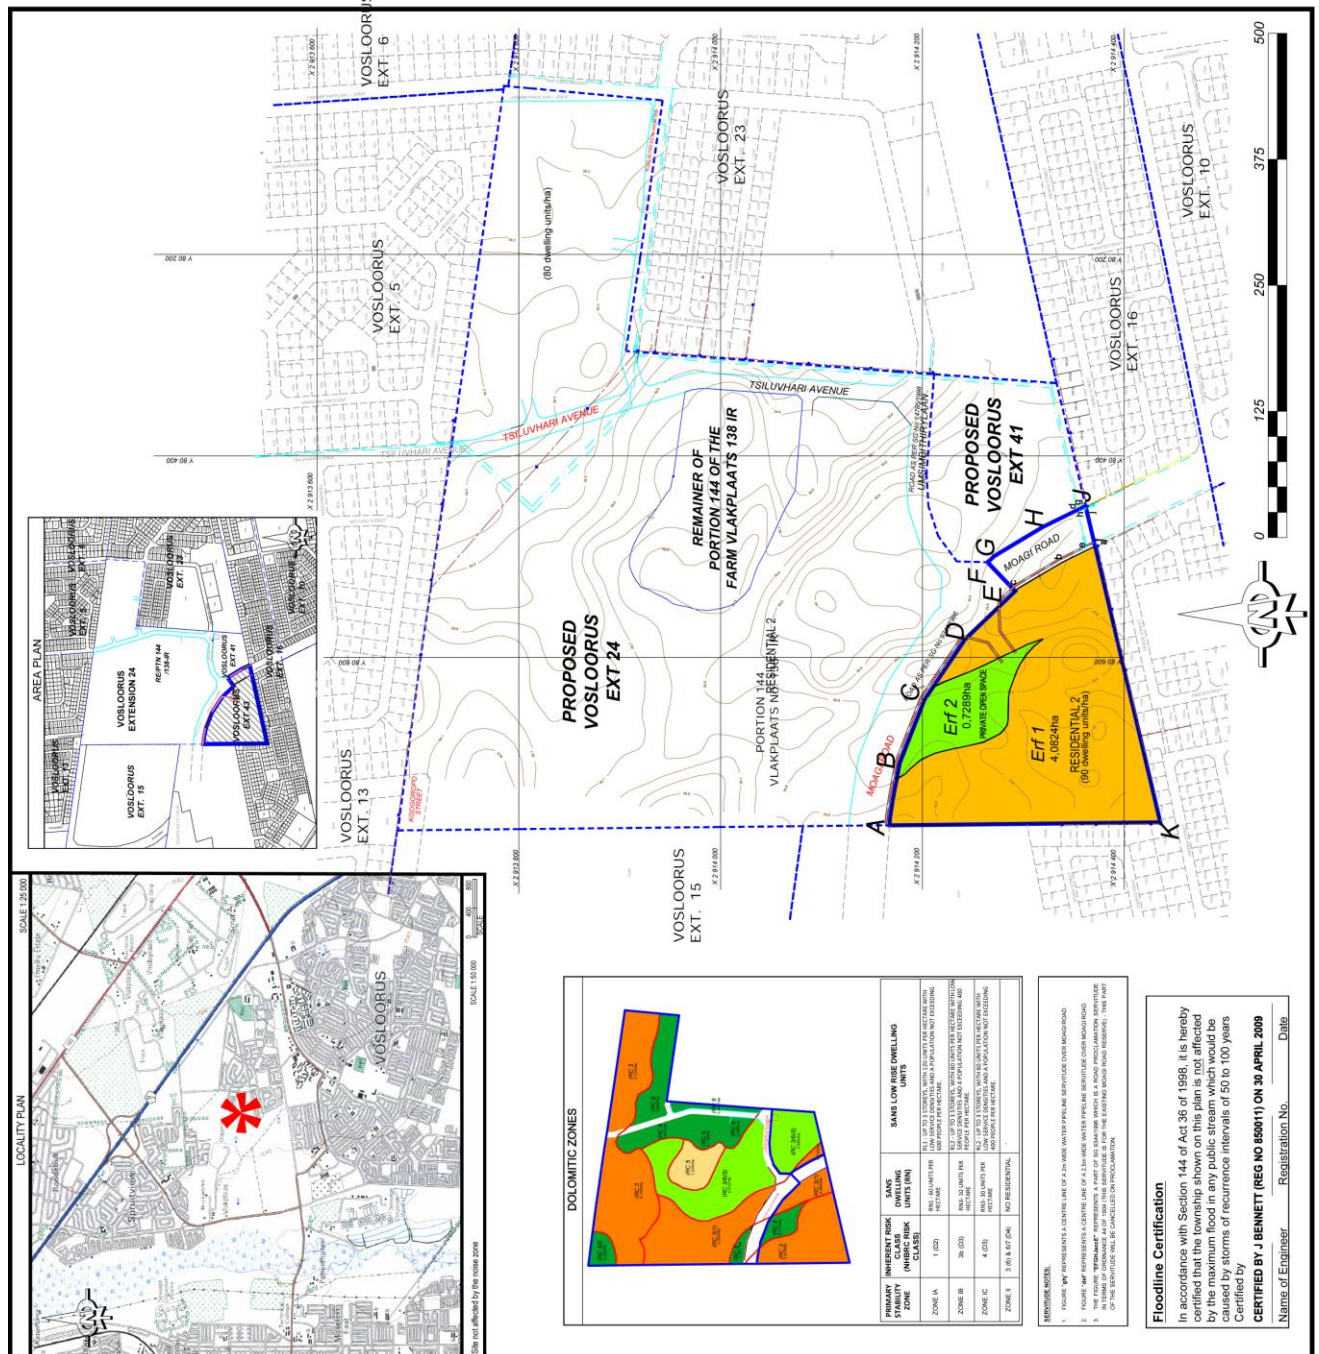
Development layout plan for Vosloorus Extension 43. The plan was supplied by Enkanyini Projects.
